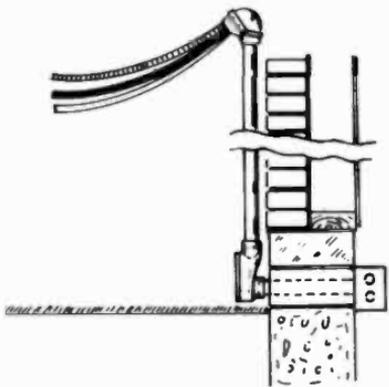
To get power to overhead wires you must install fully enclosed and watertight conduit and fittings. From inside junction box, a short piece of conduit goes through foundation to right angle elbow, through vertical conduit, and out special service head.
